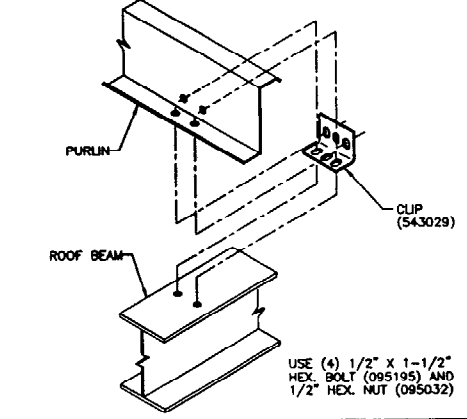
PURLIN BRACE TOP AND BOTTOM ROW
